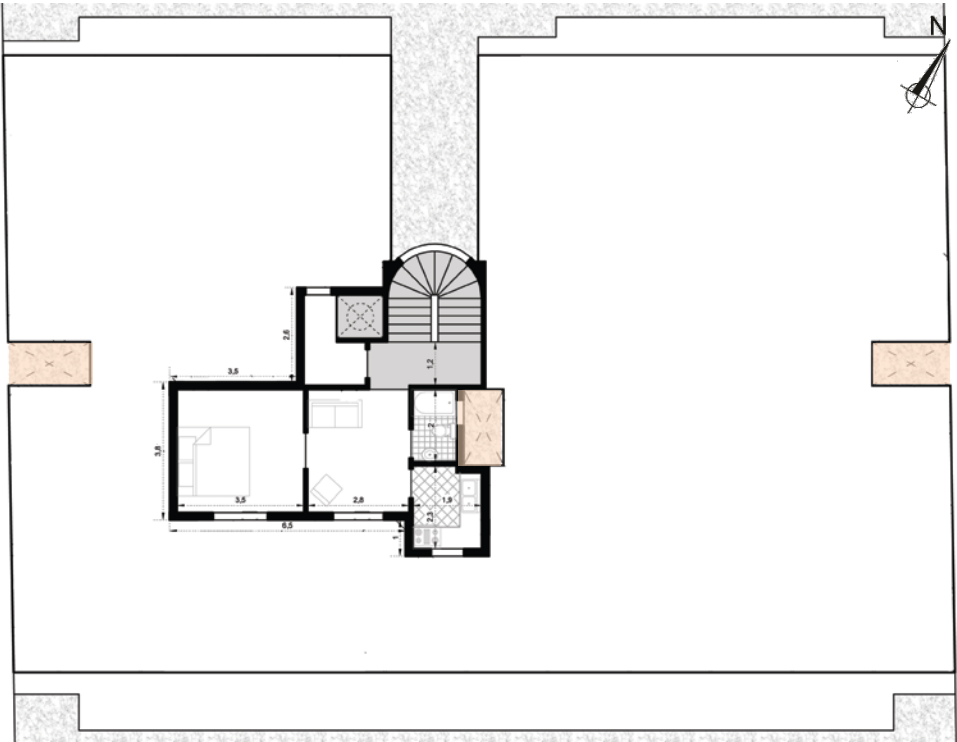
Penthouse plan view CAD drawing of the building studied, by author (dimensions in metres, nts) showing the position of the light wells
